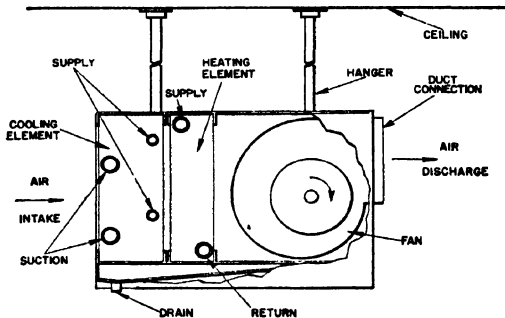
HORIZONTAL REMOTE TYPE UNIT AIR CONDITIONER
